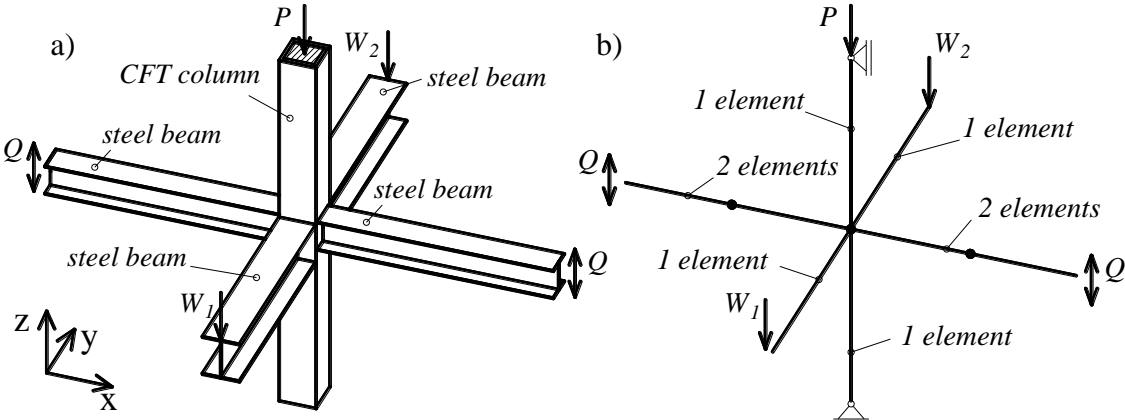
Beam-column structural subassembly test set-up (a) and numerical model (b)
